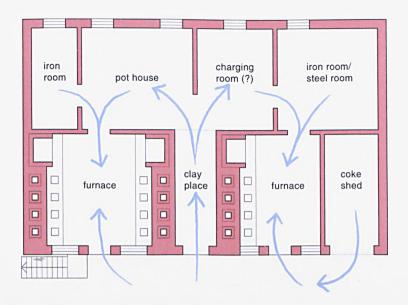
Routes most commonly followed in the working of Huntsman's 1842 melting shop, demonstrating the importance of the plan arrangement. Scale 1:200 (author).
